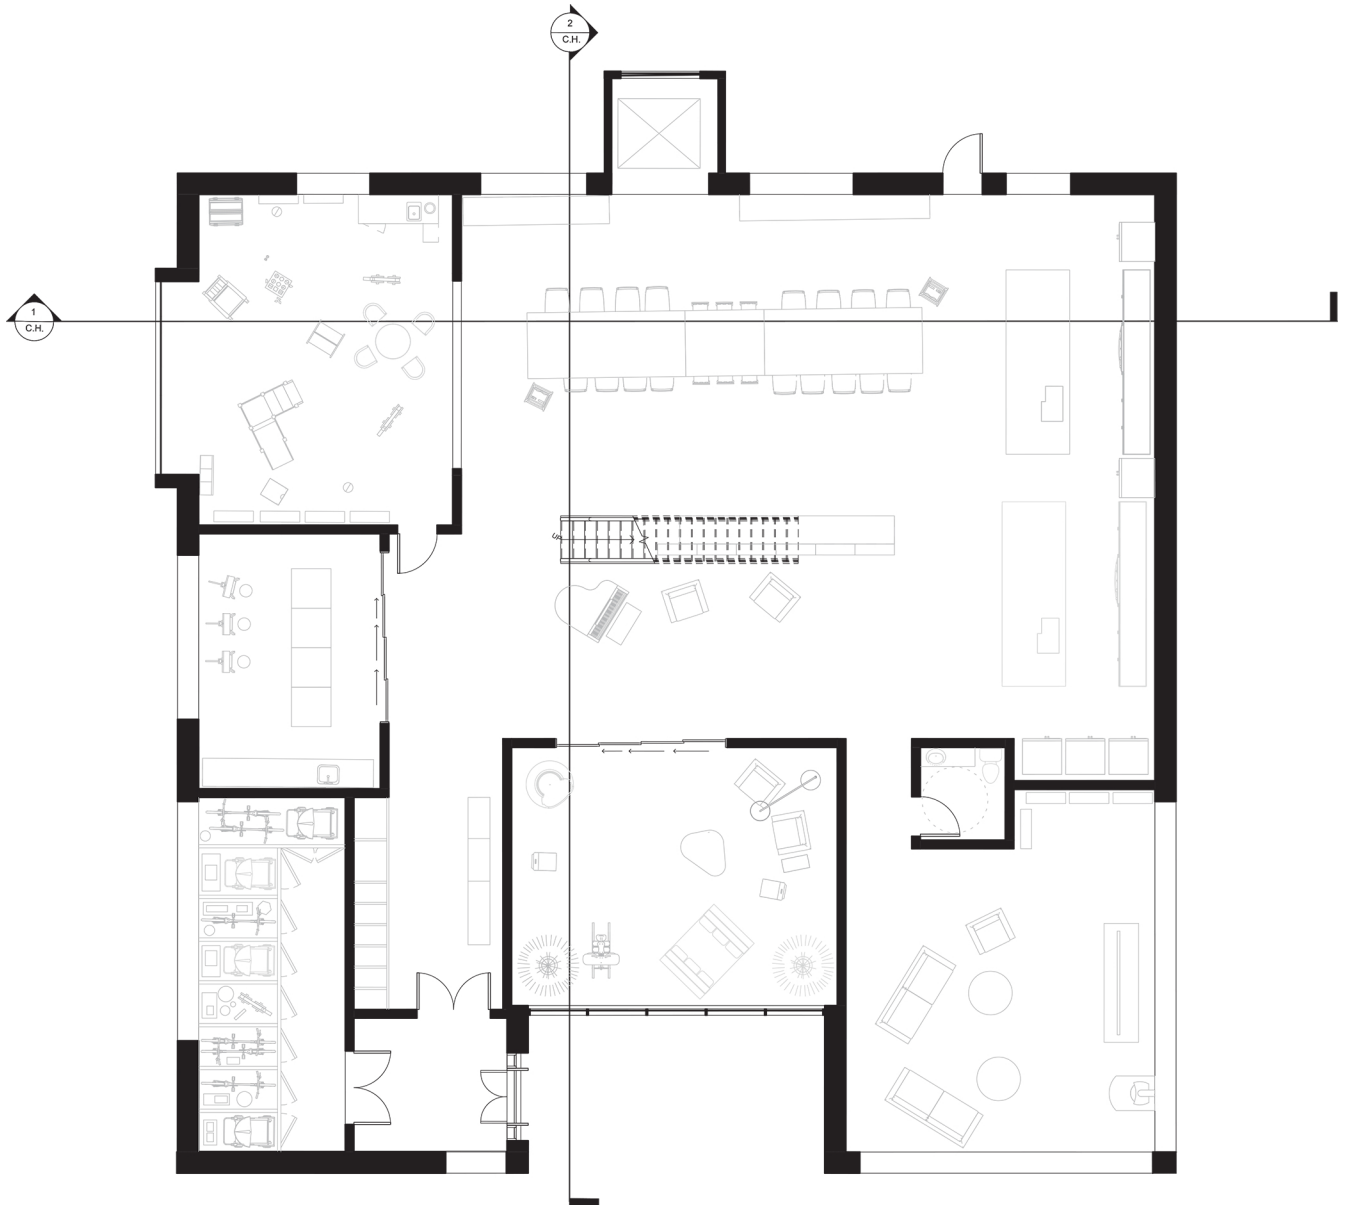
Author, *Proposed Women's Transitional Cohousing Ground Floor Plan 1:175*, 2019.
